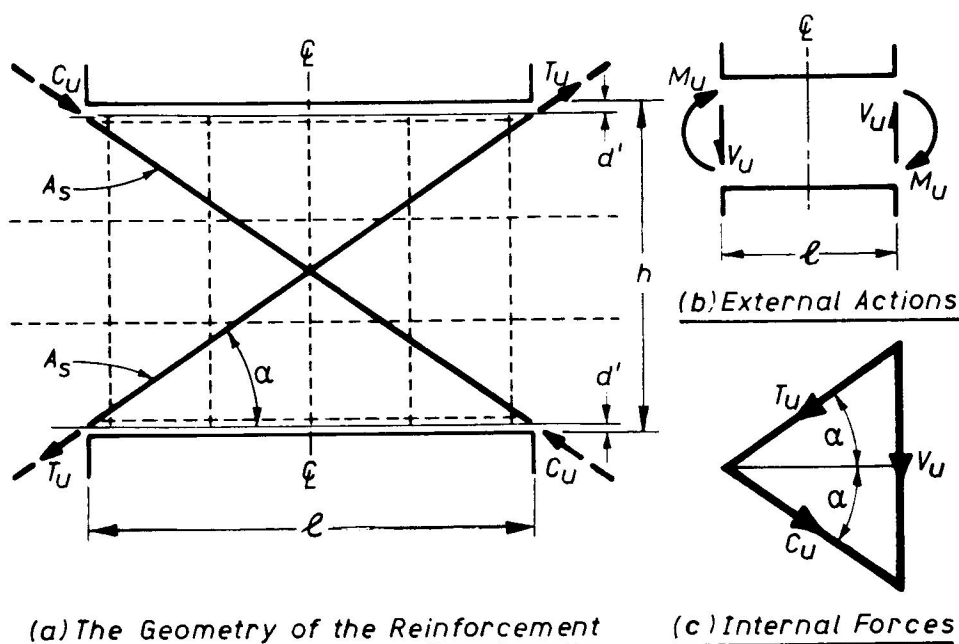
THE INTERPLAY OF EXTERNAL ACTIONS AND INTERNAL FORCES IN DIAGONALLY REINFORCED COUPLING BEAMS
